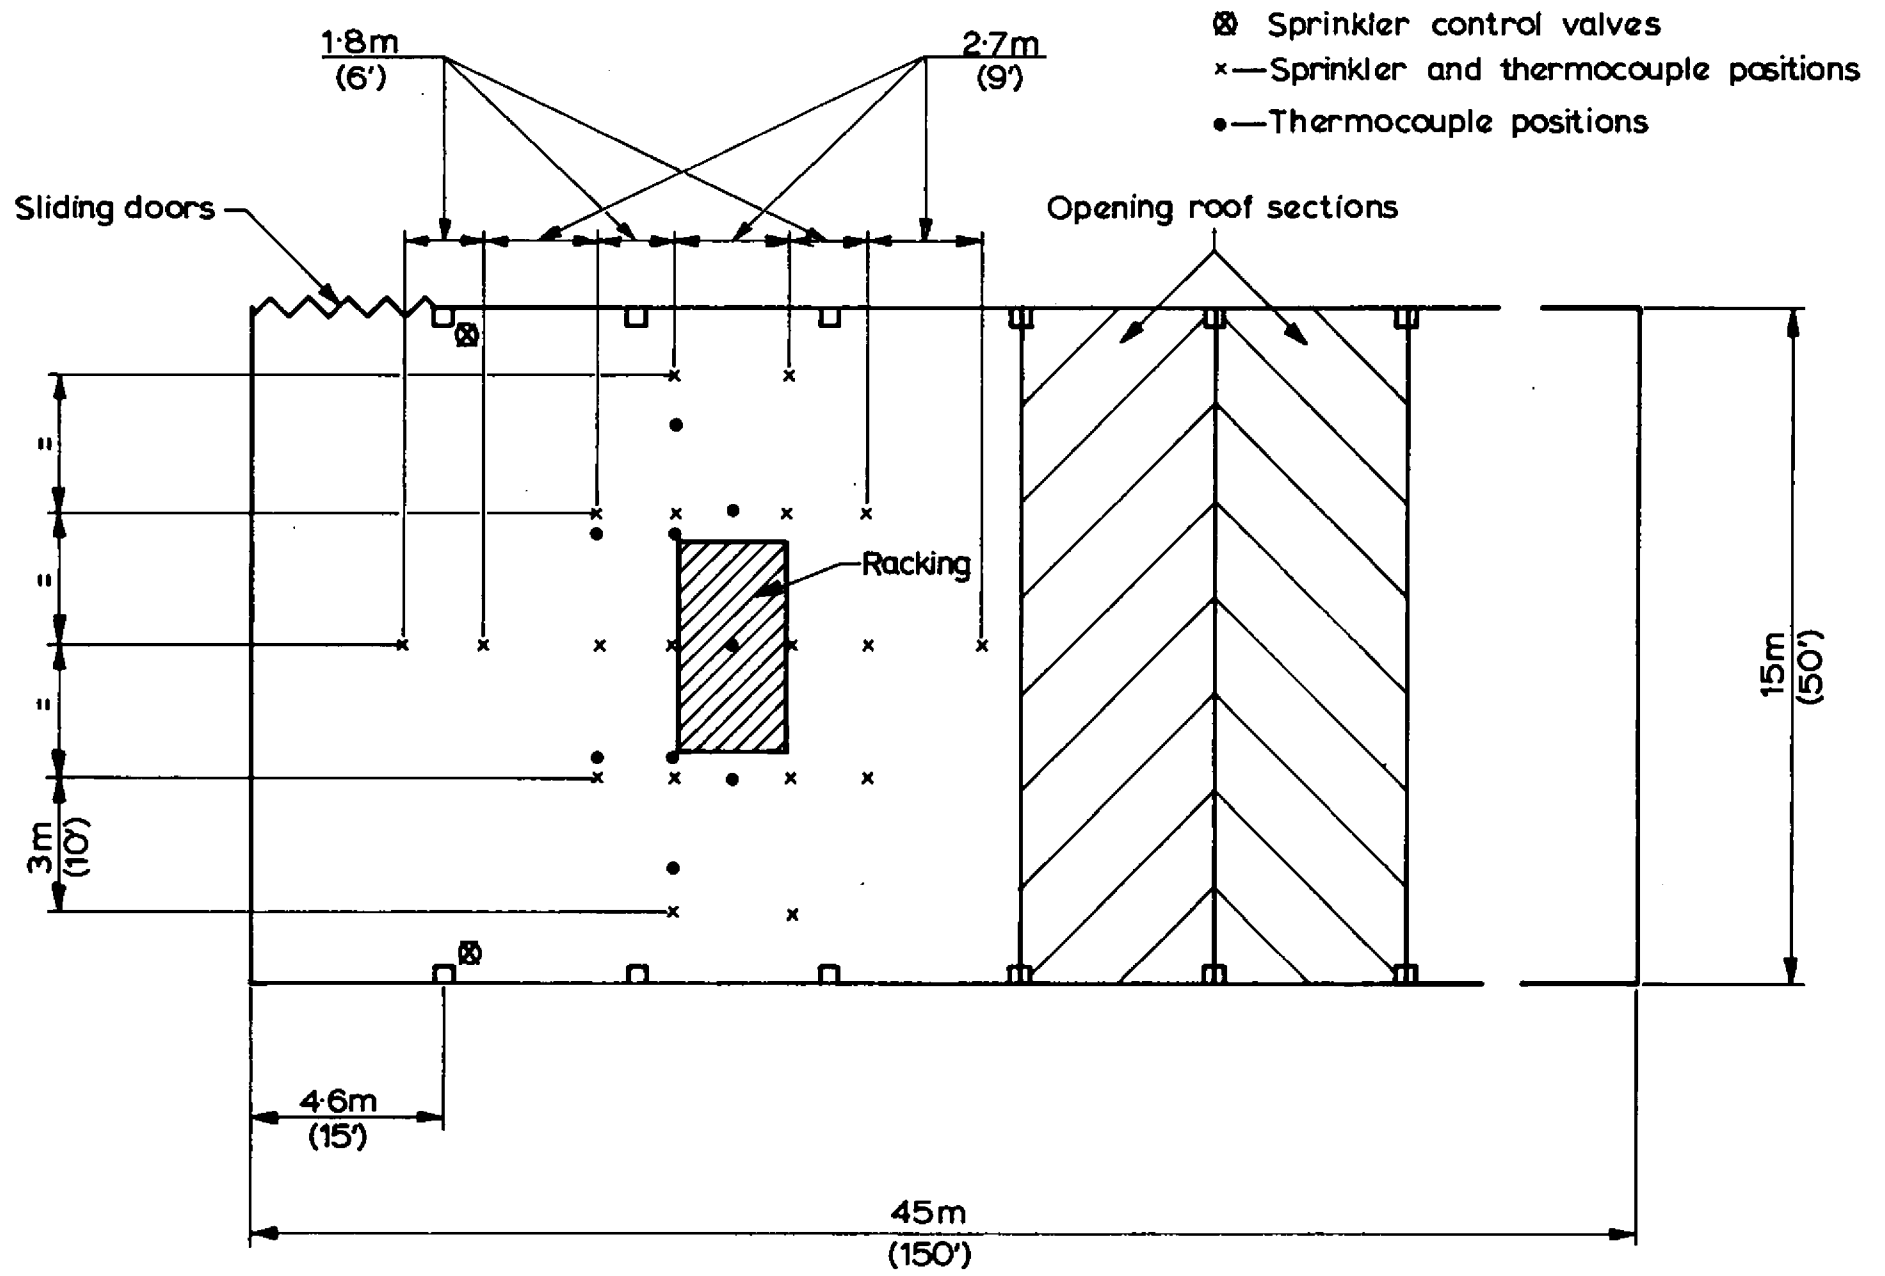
POSITION OF CEILING SPRINKLERS AND THERMOCOUPLES
